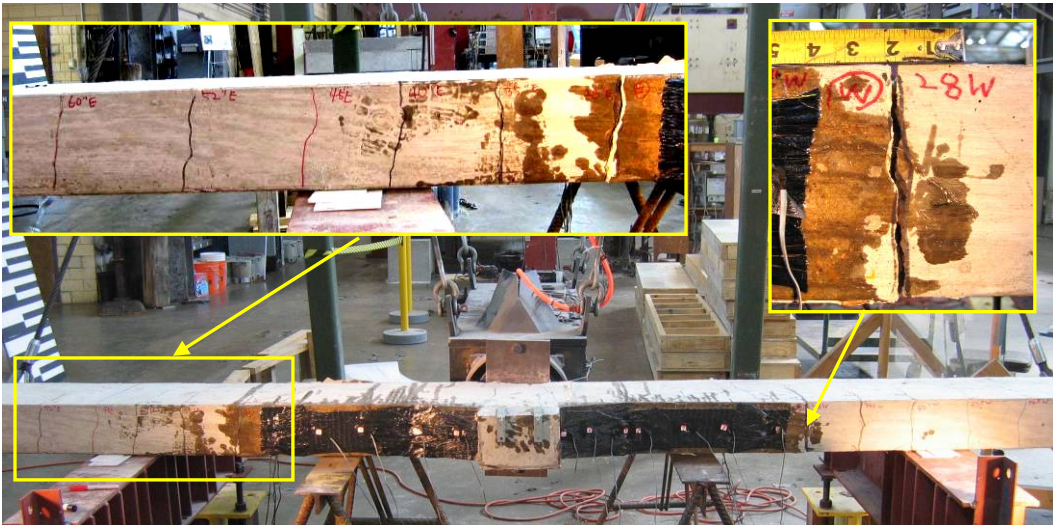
Failure of C-BC-A-6G-01, 9 in. (yield of steel reinforcement)
